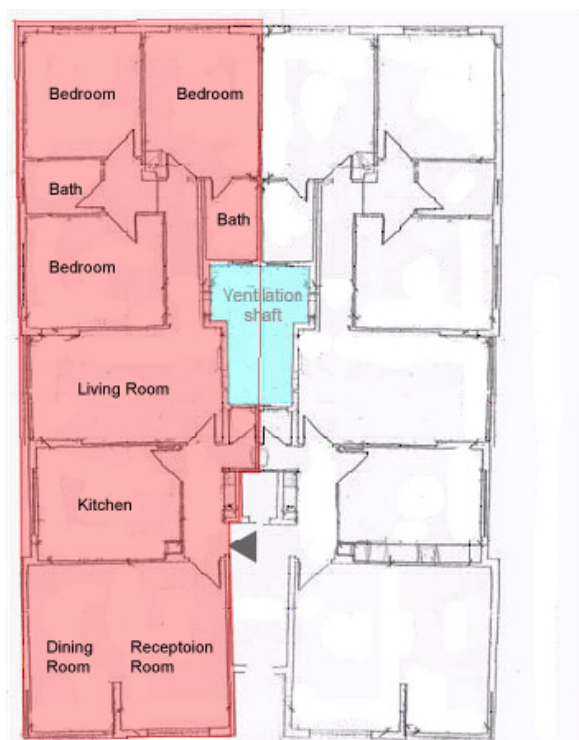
Floor plan of the tested apartment (left hand side)
